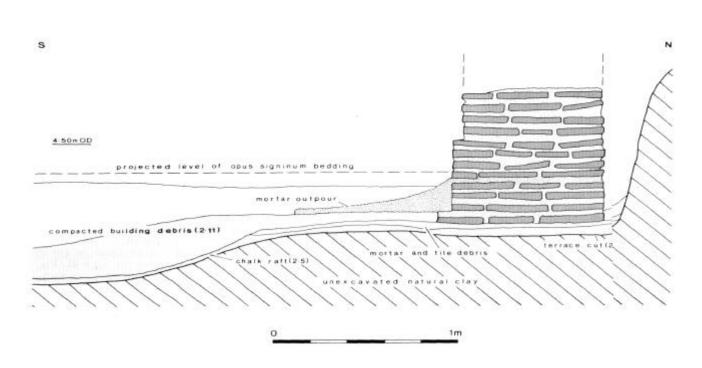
Peter's Hill; reconstructed section through the tile built terrace wall. The wall was constructed in twges, above and below a mortar outpouring. The chalk raft was only rammed smooth in the area of the wall; to the south is left in a rough state. (1:20)
